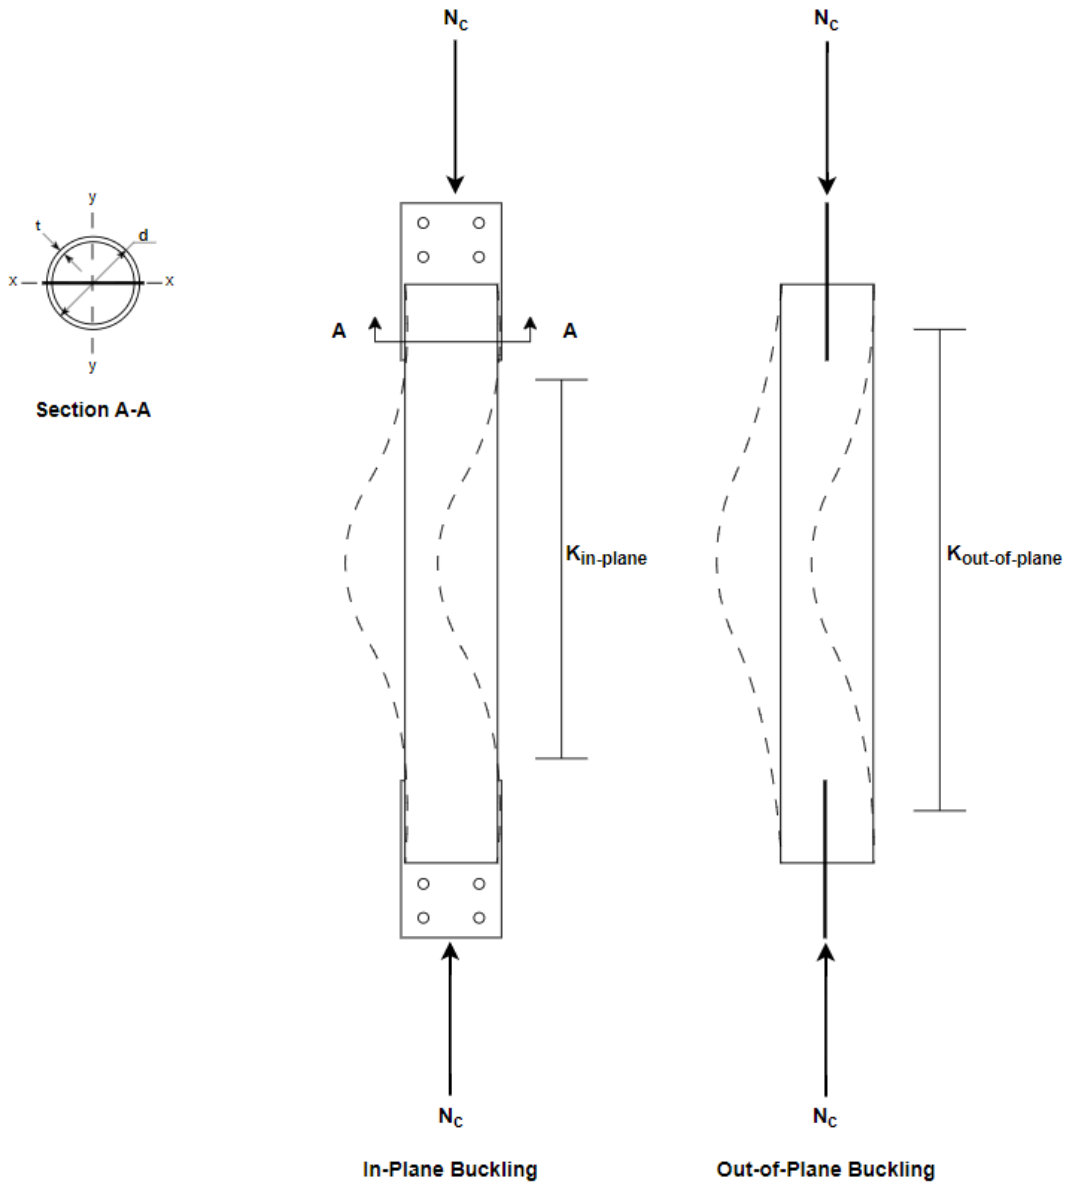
Typical CHS Member In the Plane of Frame and Out of the Plane of Frame Buckling Shapes
